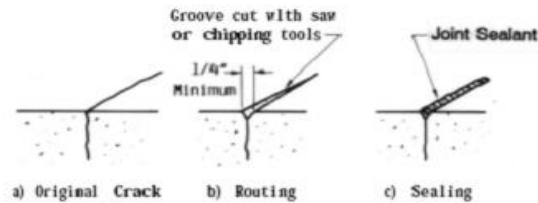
Repair of crack by routing and sealing (Johnson 1965)
